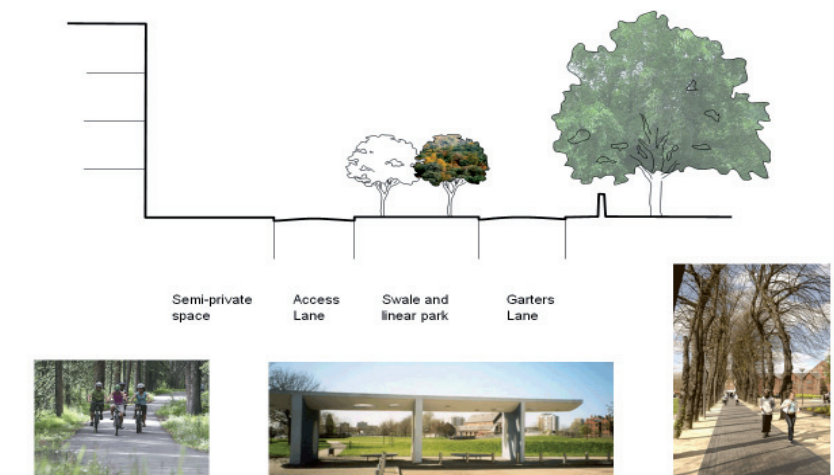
Section of proposed Garter Lane Avenue showing Boulevard.
